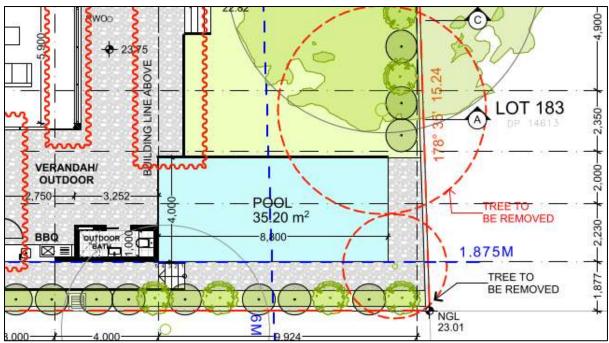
Original ground floor plan showing proposed swimming pool, surrounding paving areas and proximity to trees.
